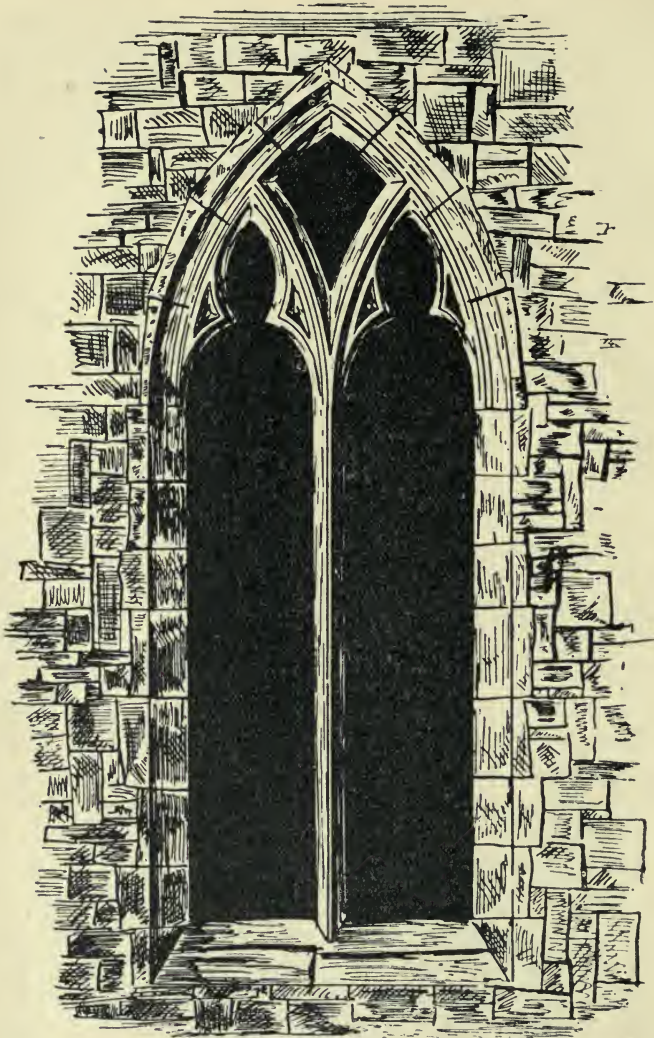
WINDOW (ABOUT 1300) IN NORTH WALL OF PARISH CHURCH.
